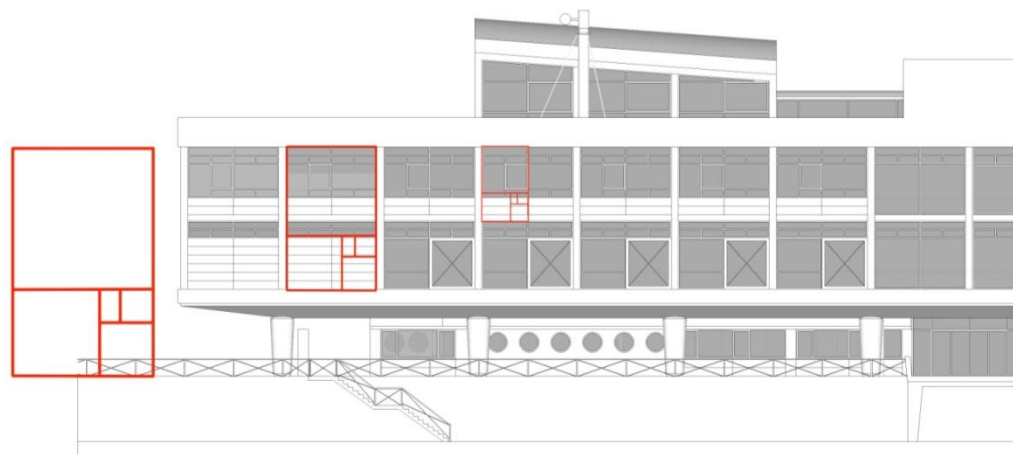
Reappraised digital model demonstrating the use of the golden section in elevation.
